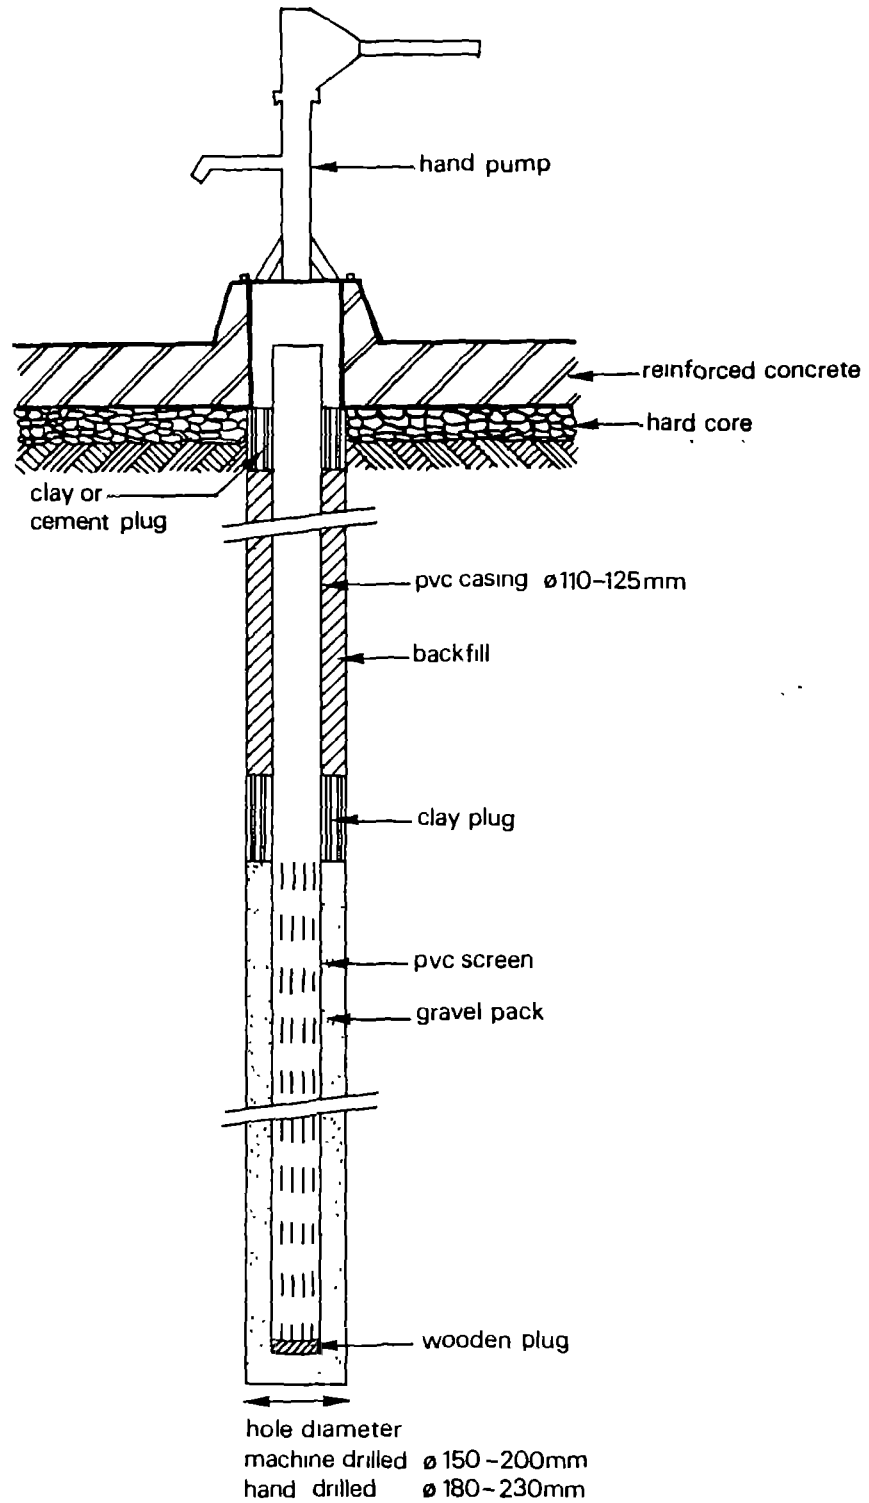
RDWSSP hand drilled well and bore hole design.
